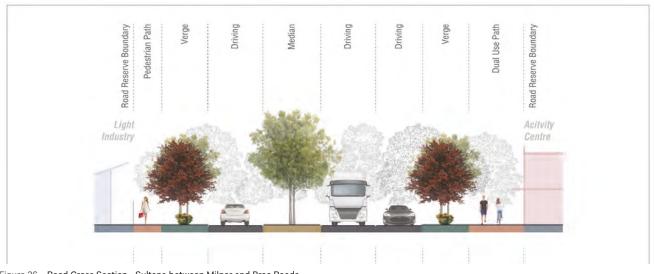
Road Cross Section - Sultana between Milner and Brae Roads
